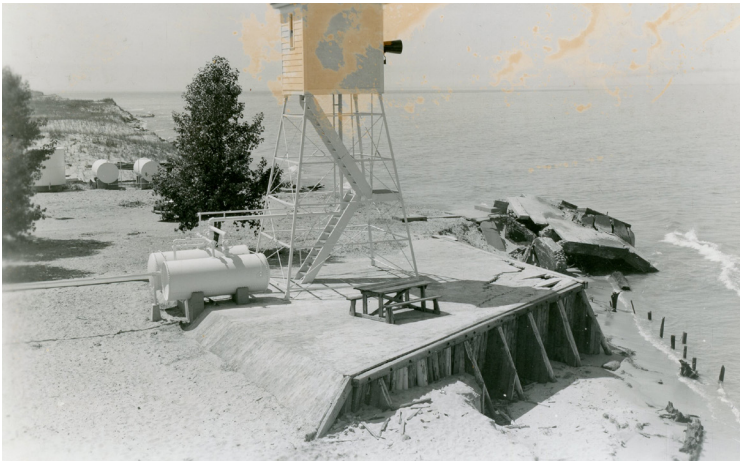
B-57: August 1943 photo looking southwest. The brick and cement cap began collapsing at the northwest corner by this time.
